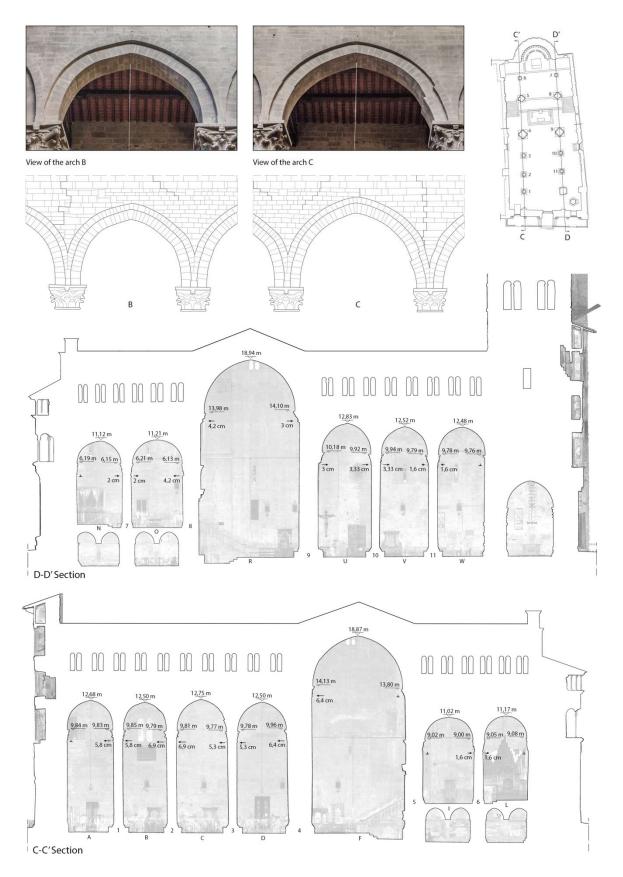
Longitudinal sections corresponding to the pillars which highlight the deformations of the structure.
